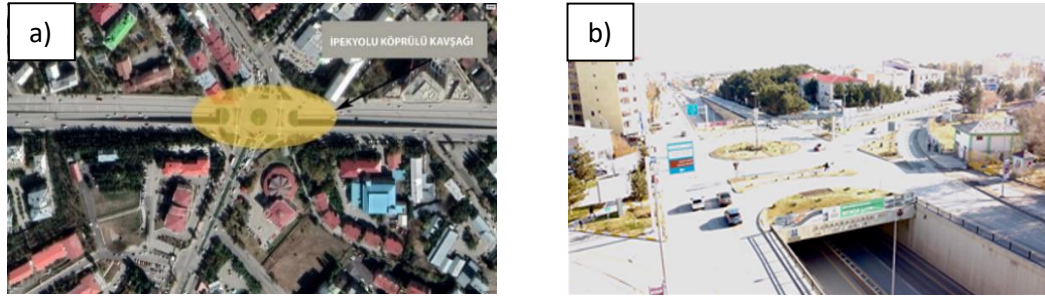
a. Location of the İpekyolu Bridge intersection, b. General view of the İpekyolu Bridge Intersection (Gürbüz, 2021)
